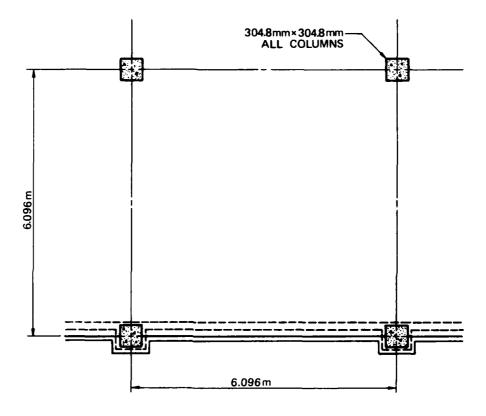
BLDG 167, LAFAYETTE TOWERS BUILDING #2 - Floor System
